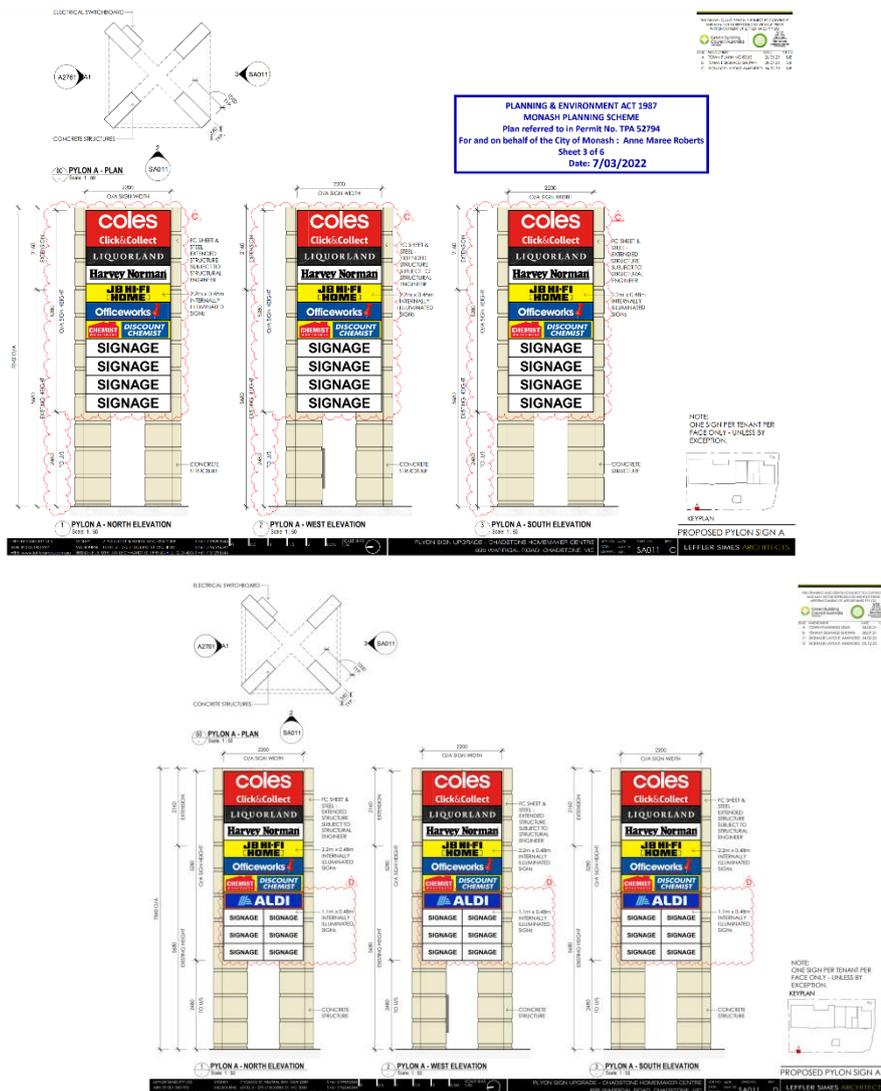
Existing endorsed plans and proposed amendments to Pylon A
